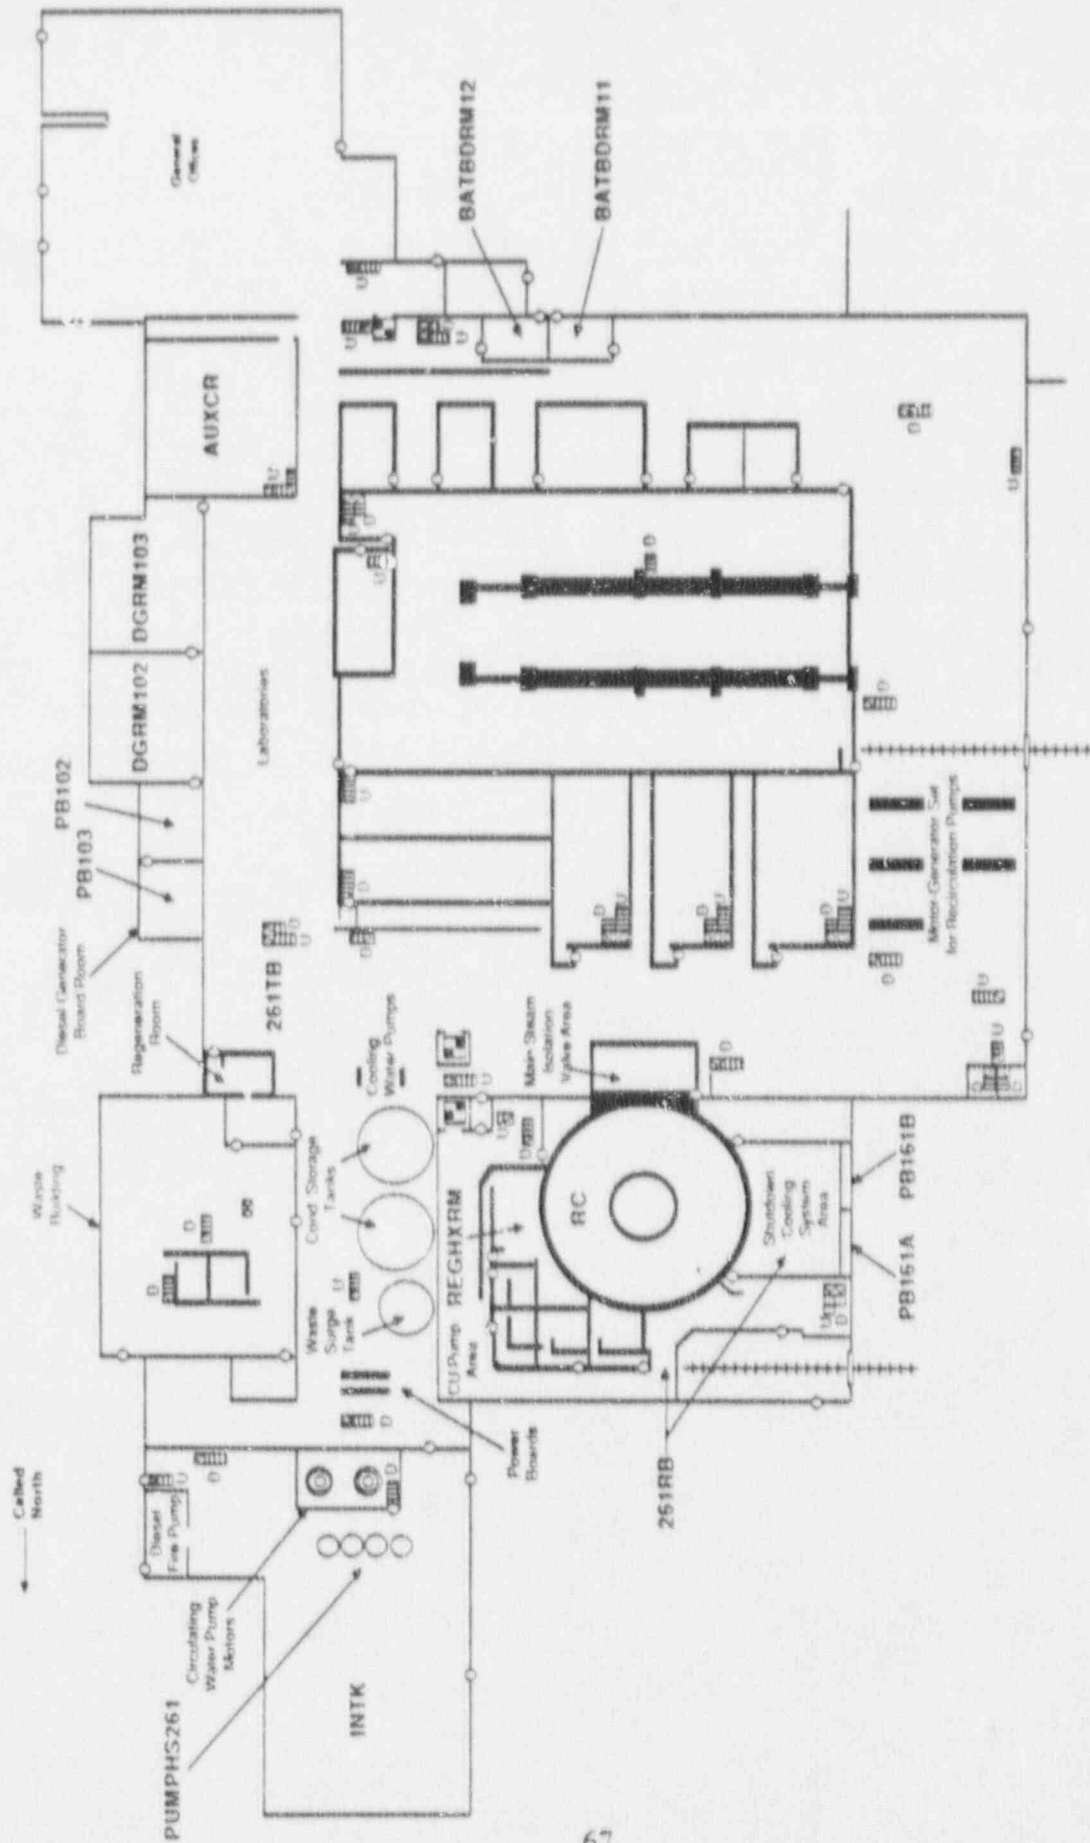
Nine Mile Point 1 Elevation 261\
